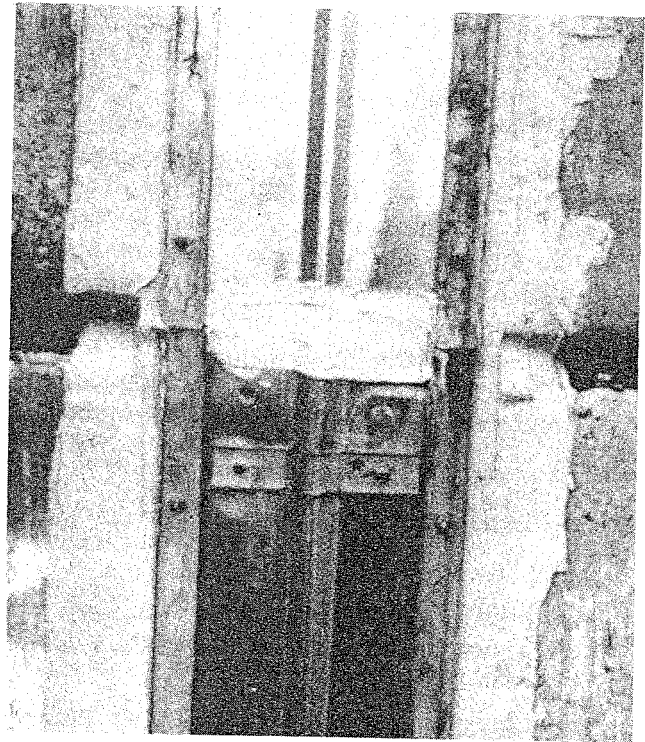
Upstream face of monolith joint with completed external waterstop, Richard B. Russell Dam
